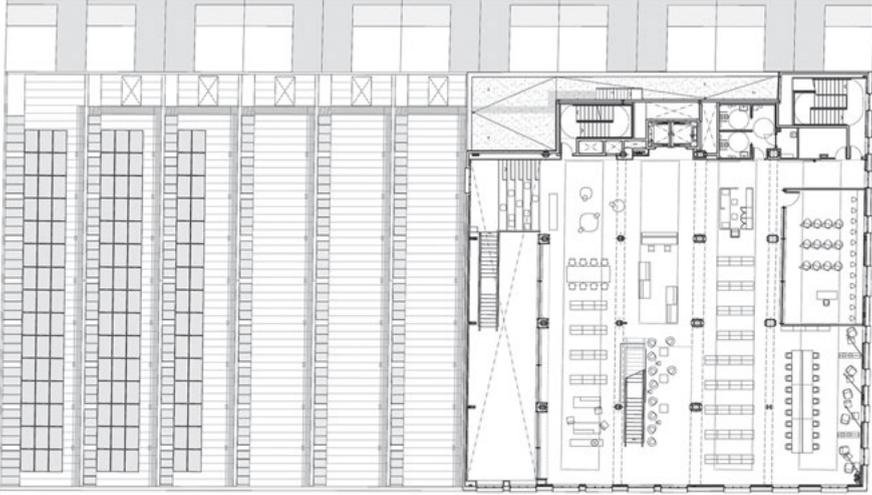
First floor plan. © Ricard Mercadé Aurora Fernández arquitectes.
